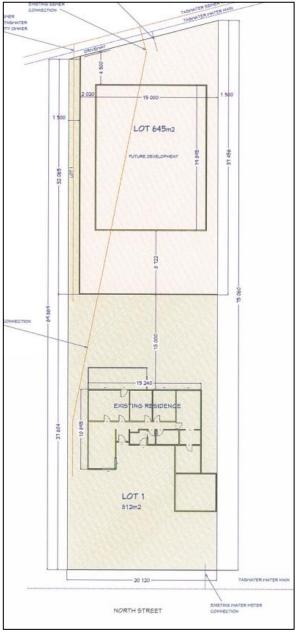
Subdivision layout submitted by applicant (ZACEDEN PROPERTIES)
